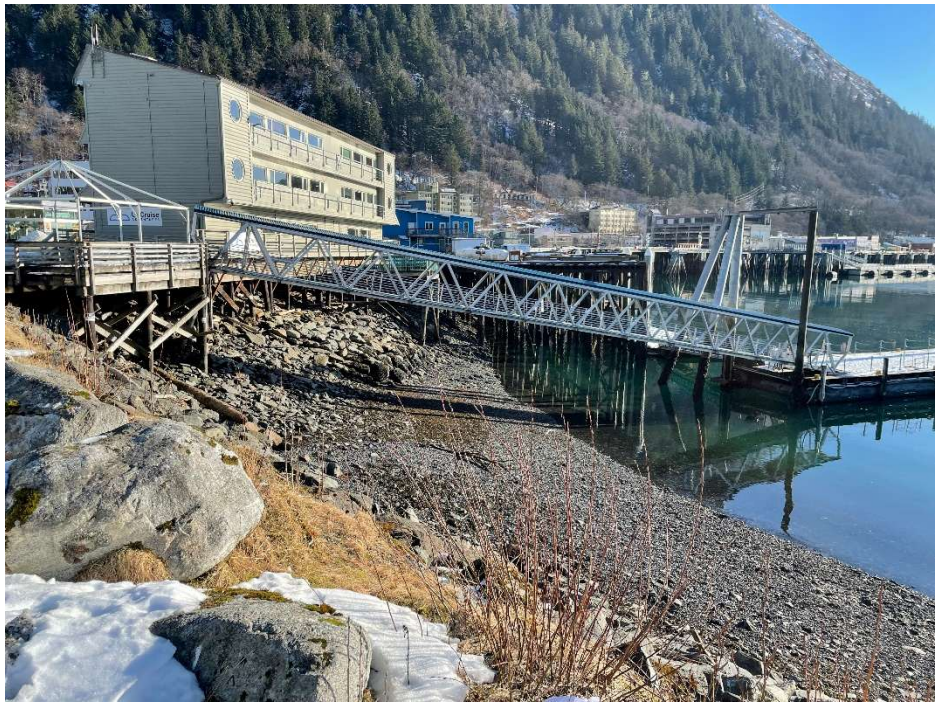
Looking east towards CX4. Note CX3B as photo left under small deck.
